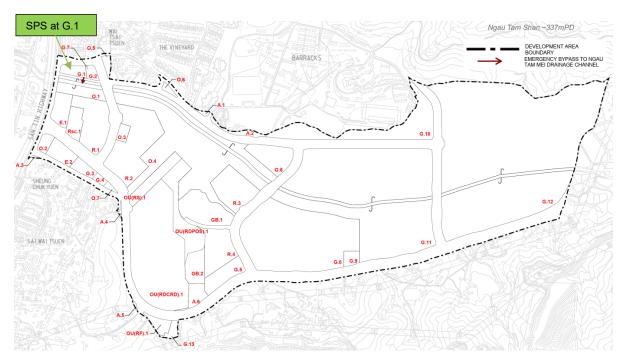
Proposed Location of SPS and Emergency Bypass Alignment
